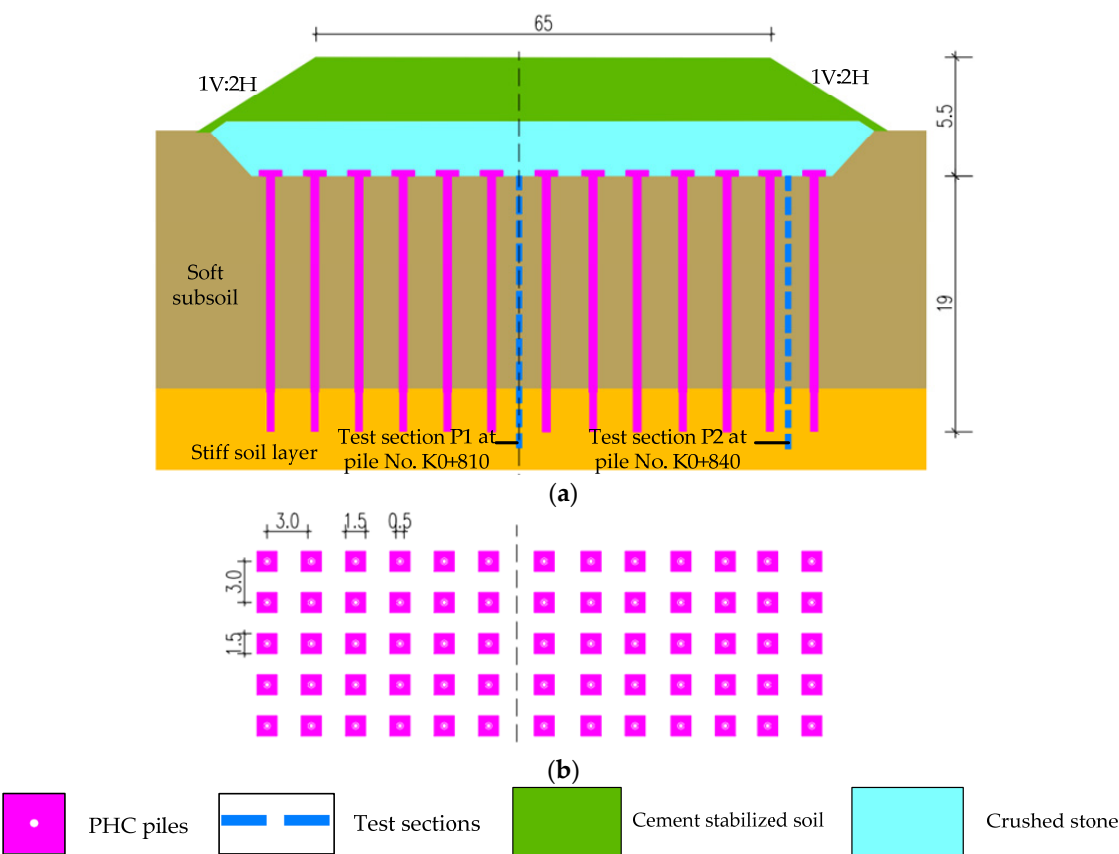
Loading schemes for PHC test: (a) Cross section. (b) Pile location layout.
